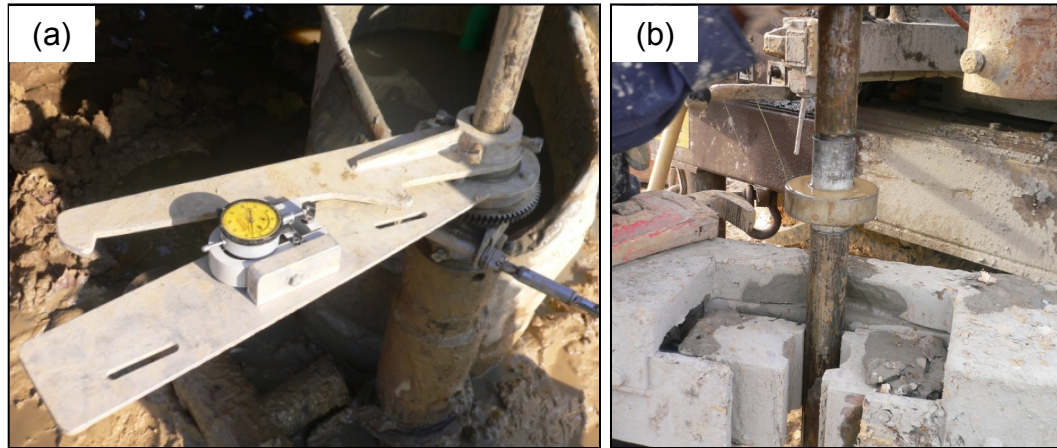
(a) Force arm and sub mounted on the casing (b) ball bearing guide coupling
